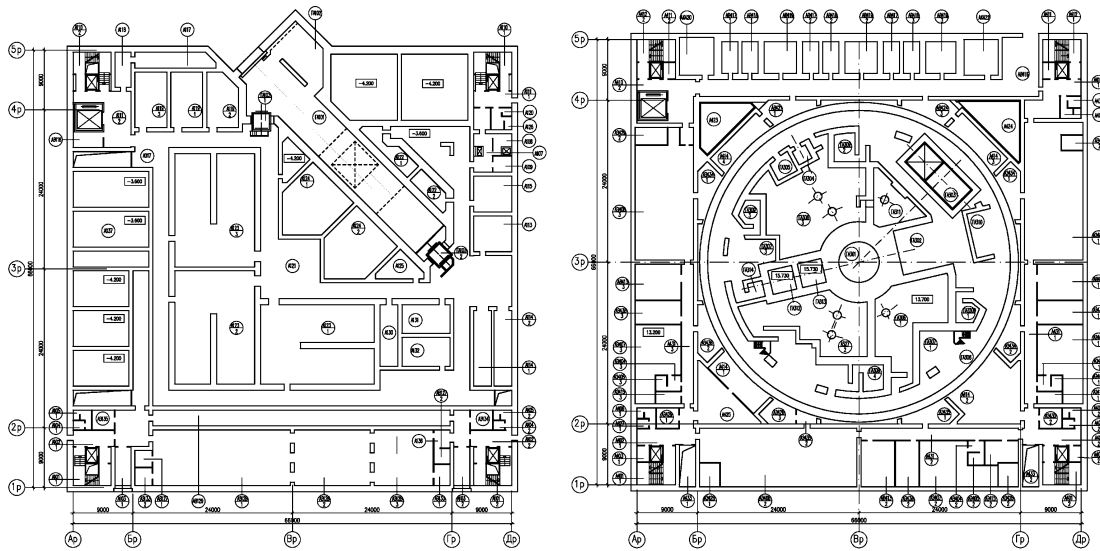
Reactor Building Plan View at Elevation 0 m (left) and 3.6 m (right)
